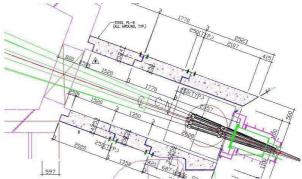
The guide shielding assembly for the primary shutter and neutron guides
